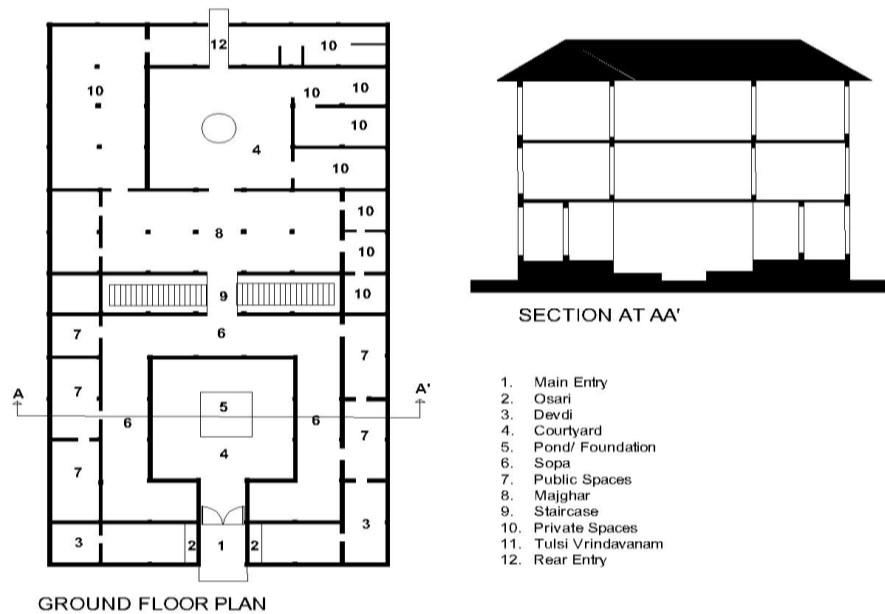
Typical Wada plan and section (Source: (Gupta, 2016))
